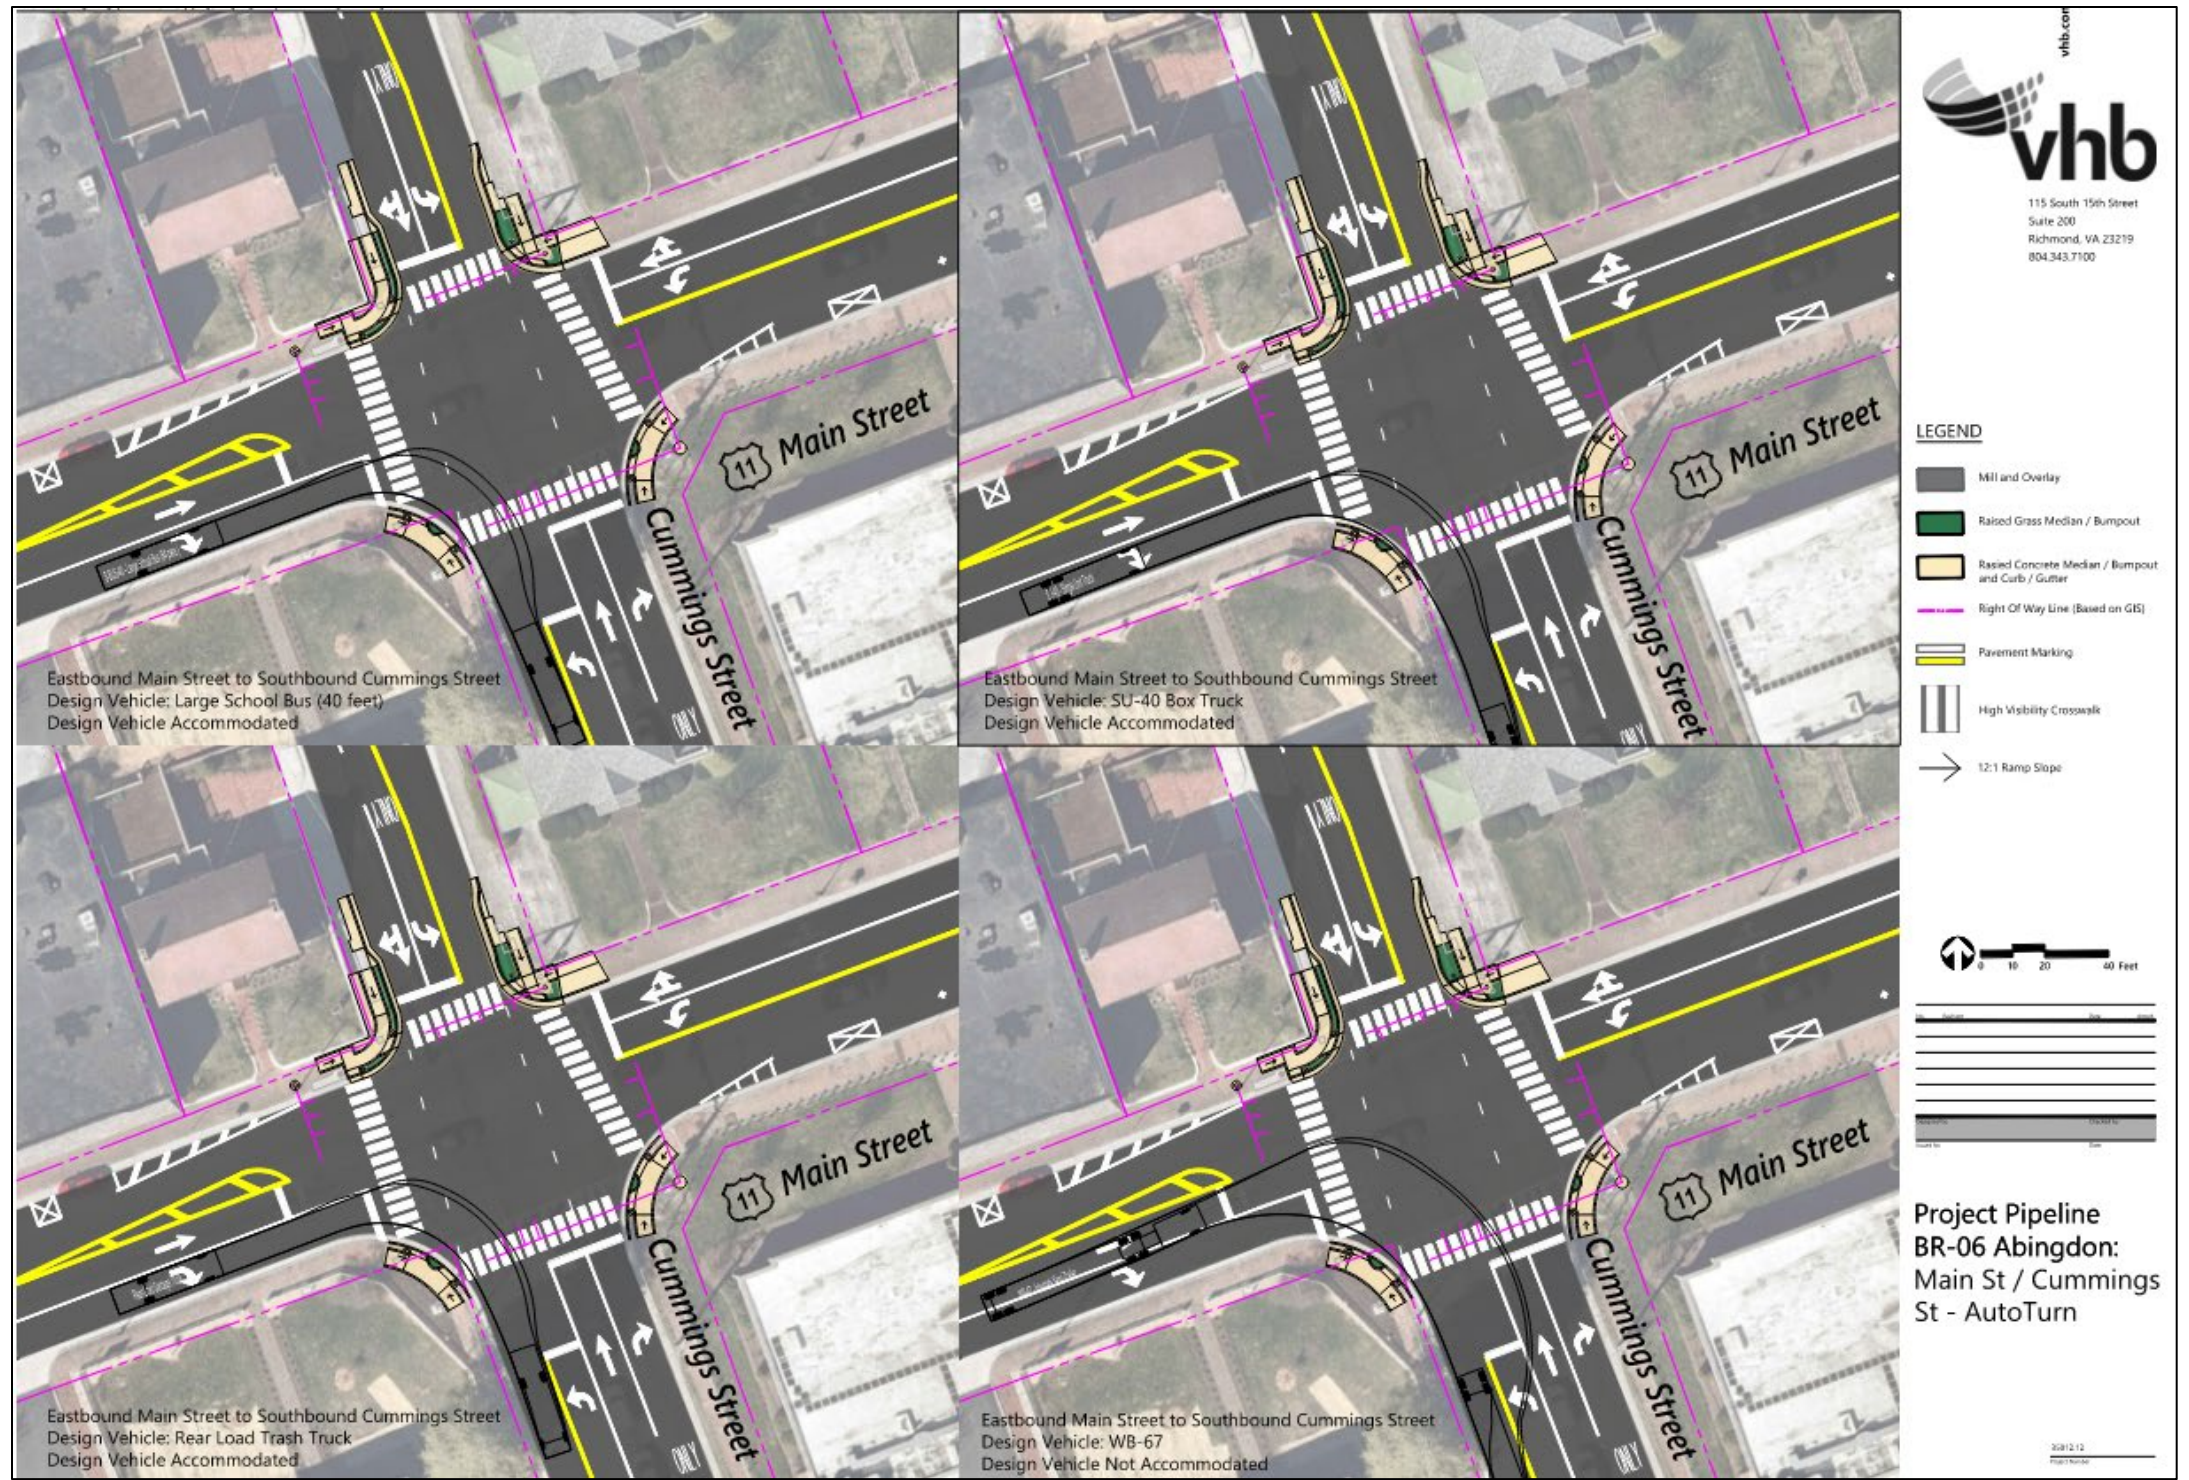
Main Street / Cummings Street Autoturn Exhibit #1
